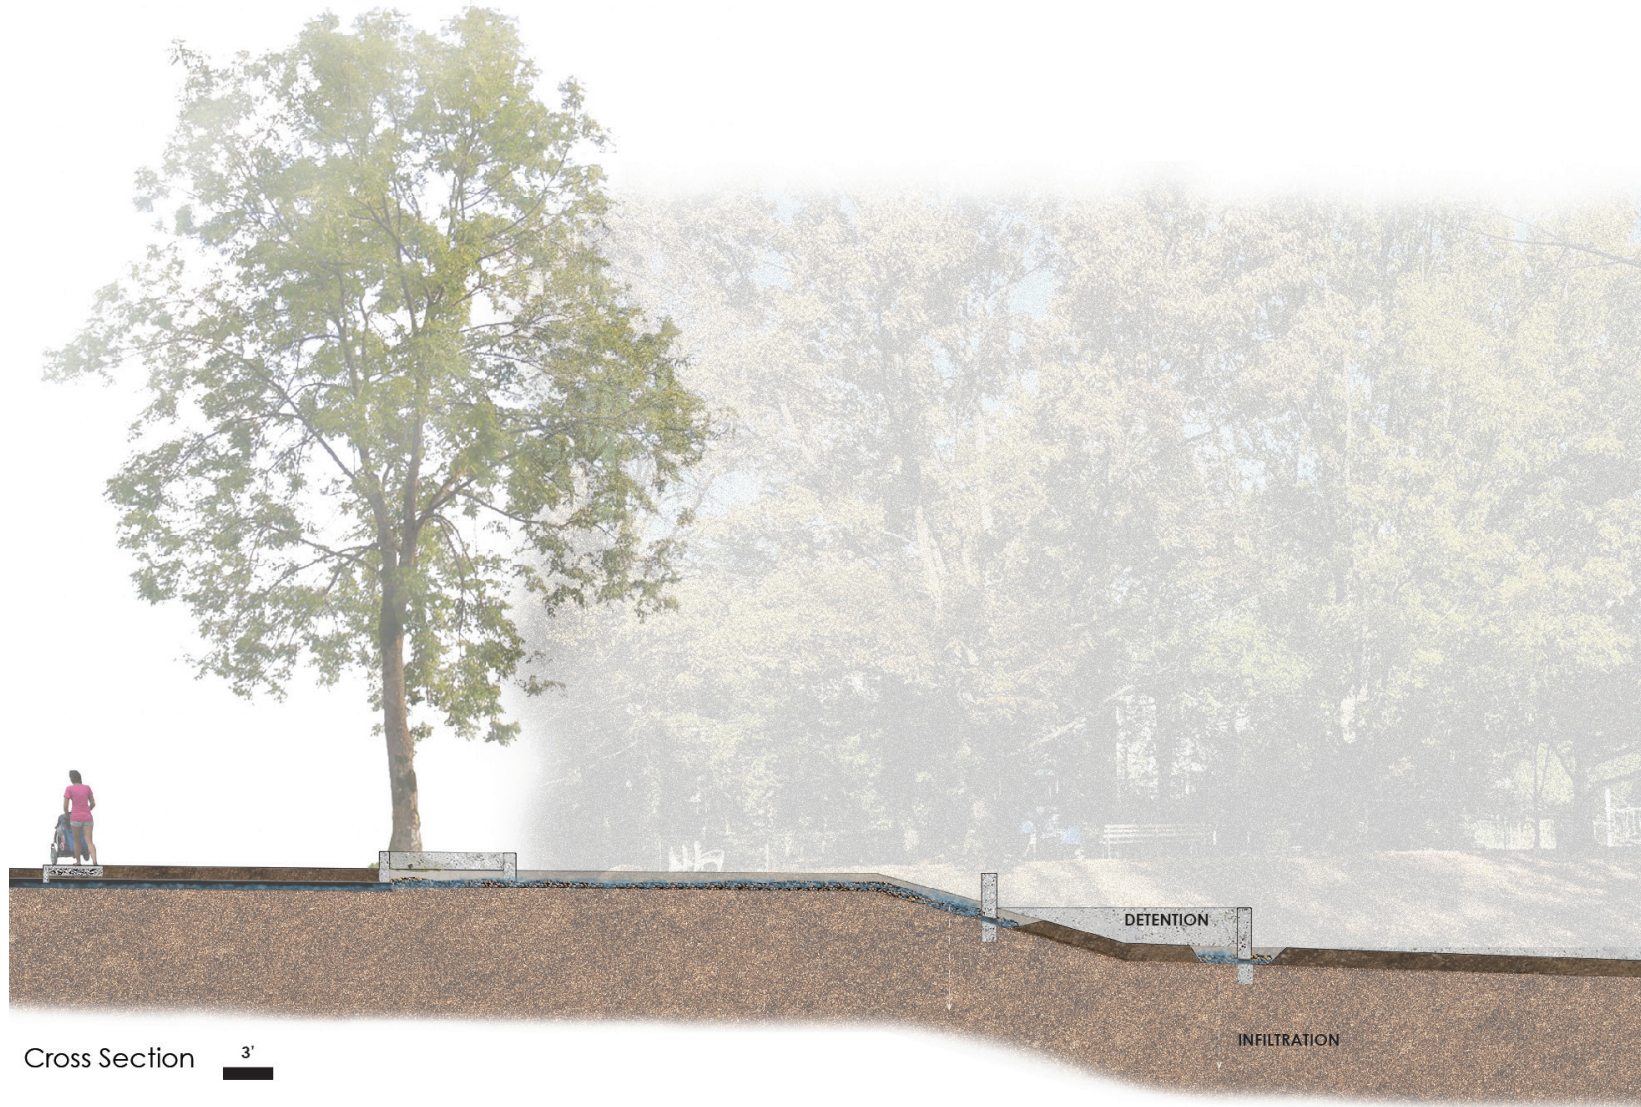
Cross Section C -Spout Run Headwaters Terminus at Woodstock Park
